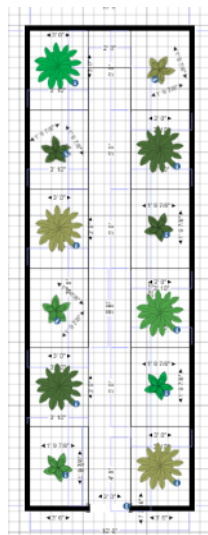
Floor Plan Model of Indigenous Garden
